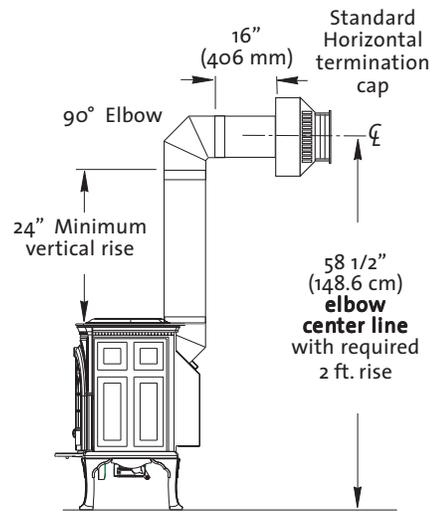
A vertical run to a horizontal termination must be at least 2 feet (61 cm). With a 2 ft. rise, maximum horizontal run may be no more than 16" (406 mm).
